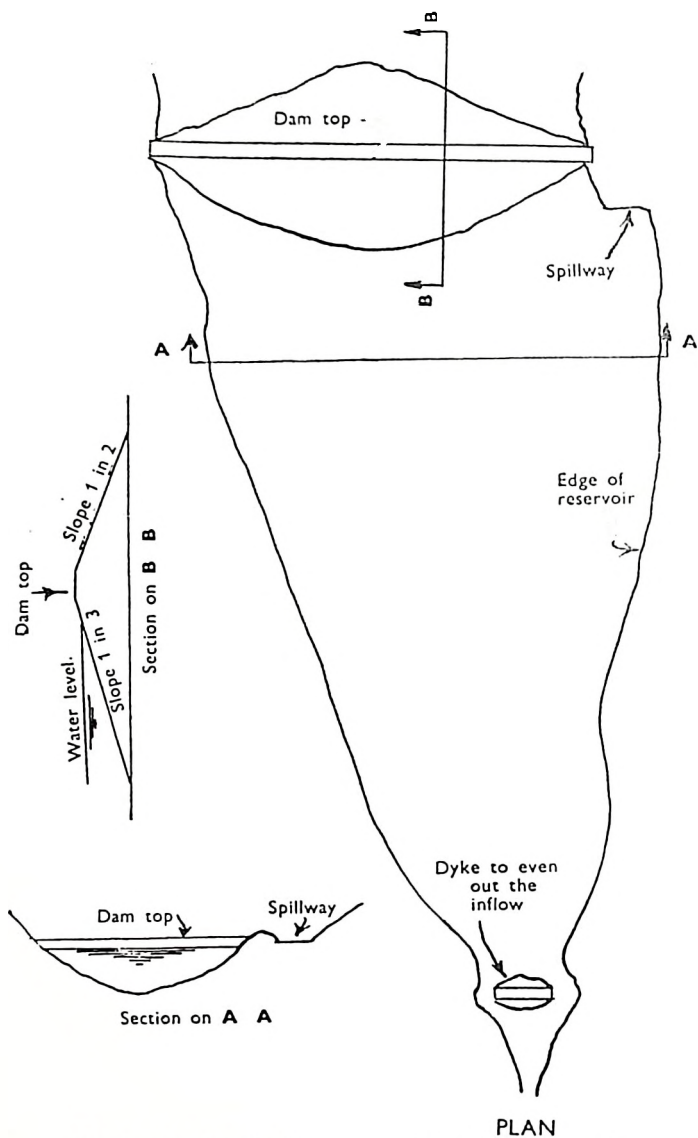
The details of an earth dam built across a ravine to form a reservoir.
